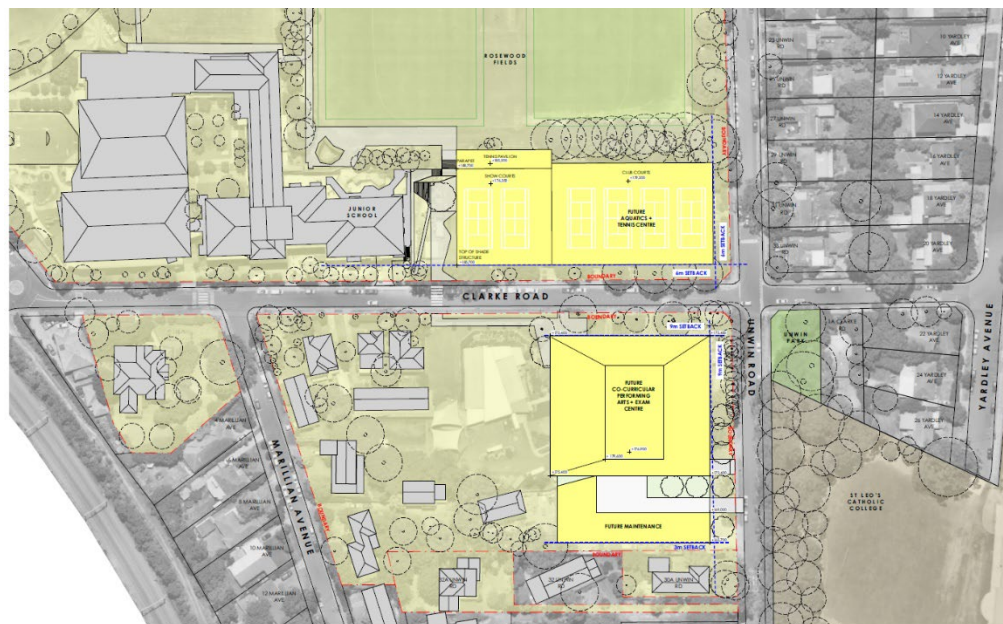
Proposed site plan, showing the location of the future Aquatics and Tennis Centre, Future Co-Curricular Performing Arts and Exam Centre and Future Maintenance. (Source: Neeson Murcutt + Neille)
